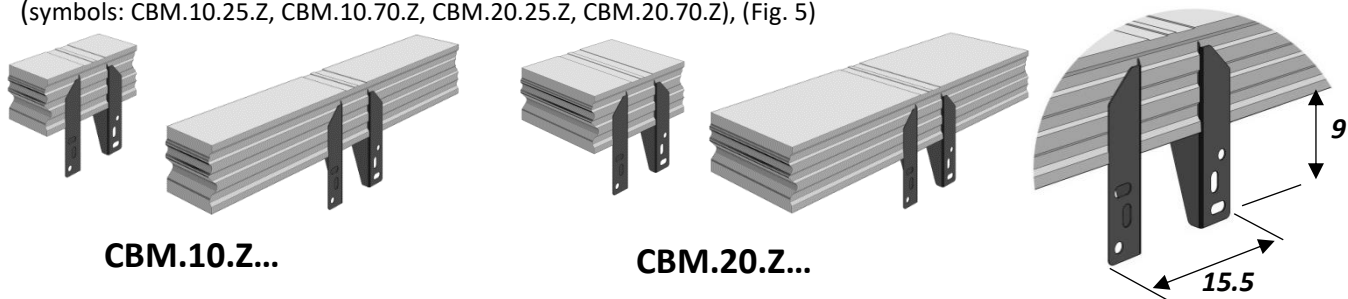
CBM model – with outer bracket - installation to a façade plane
